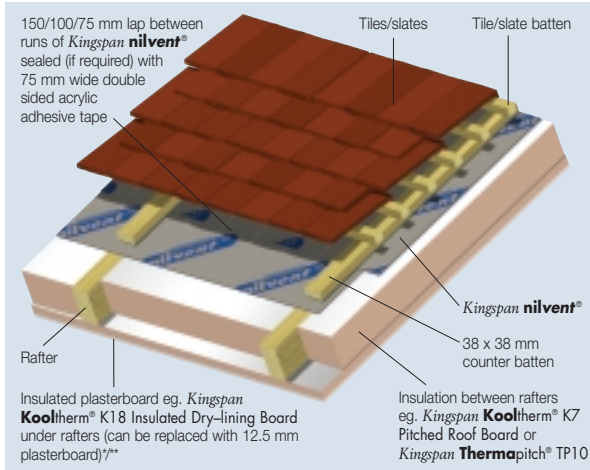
Fully Filled Insulation Between Rafters – No Sarking Board
